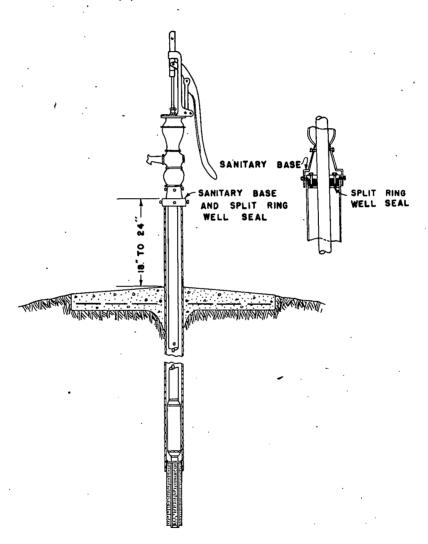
Drilled well with pump installed using a split ring sanitary well seal and a sanitary well base.
